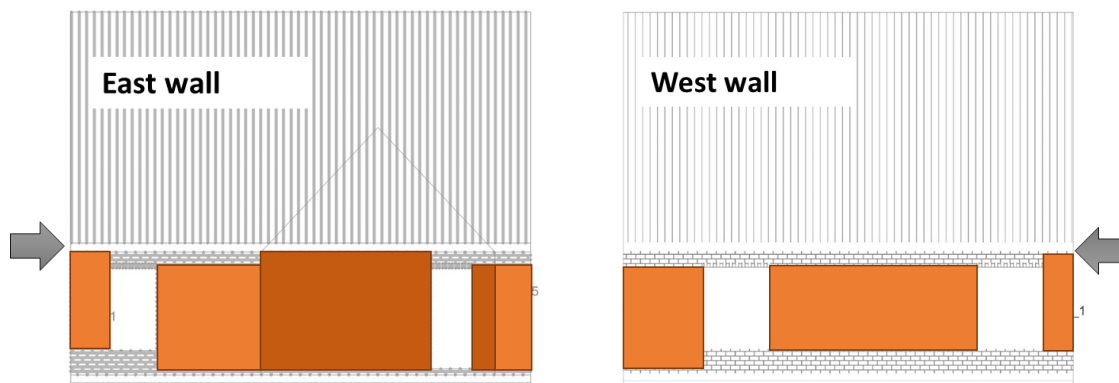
Piers defined on the east and west walls of the Building A for the positive loading (south to north) in the Y-direction. The darker colour indicates the piers on the wall of the annex.
